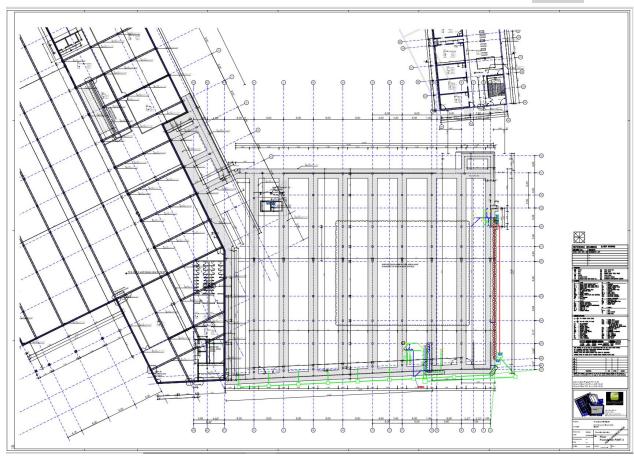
AIP Foundation (Part 2 Sheet 1)
